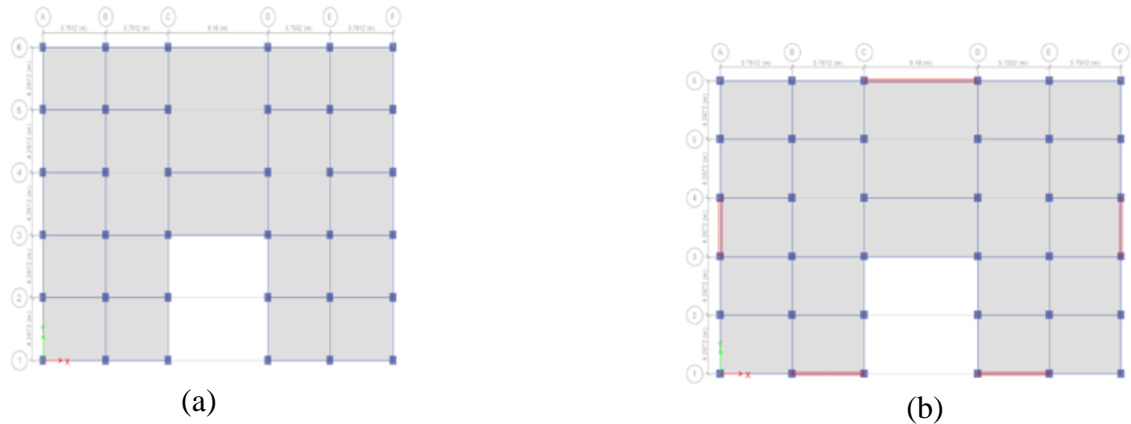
Plan view of the models with (a) bare frame (b) shear wall (Krishnamurthy et al. (2022))
